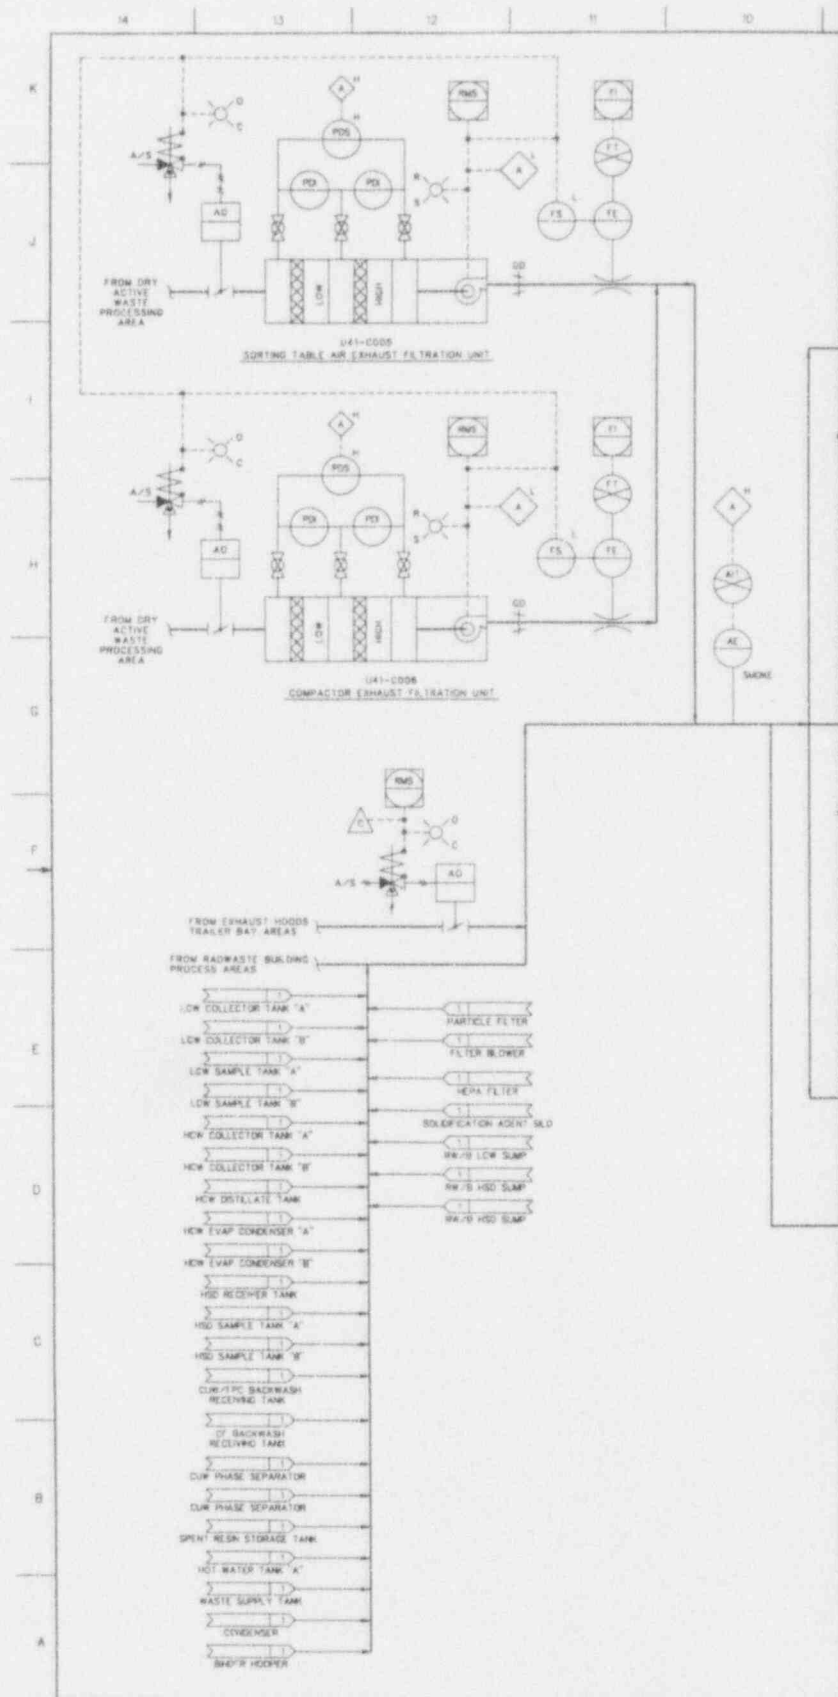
RADWASTE BUILDING HVAC, (Sheet 2 of 3)
